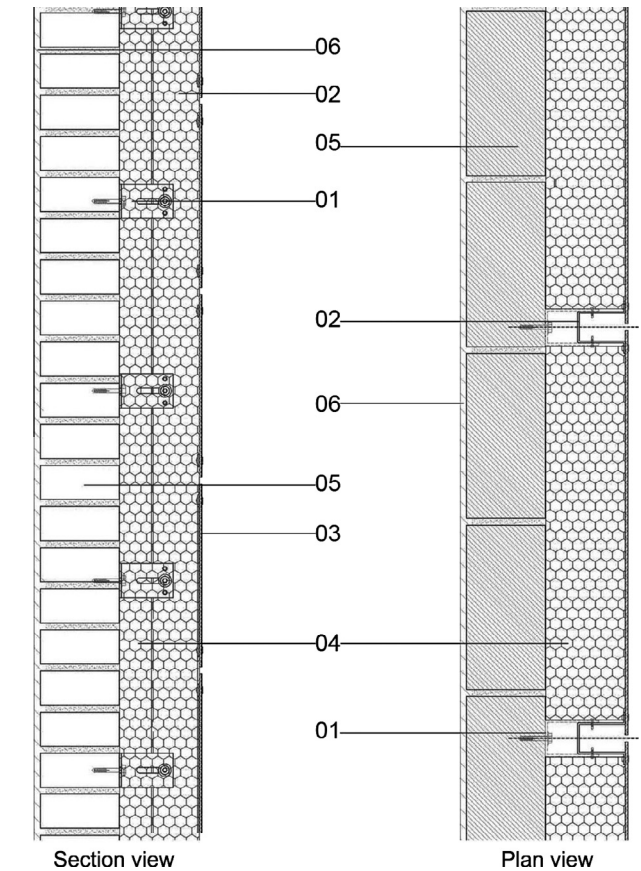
Plan and section views corresponding to the enclosure system of the Conventional Façade (CF).
